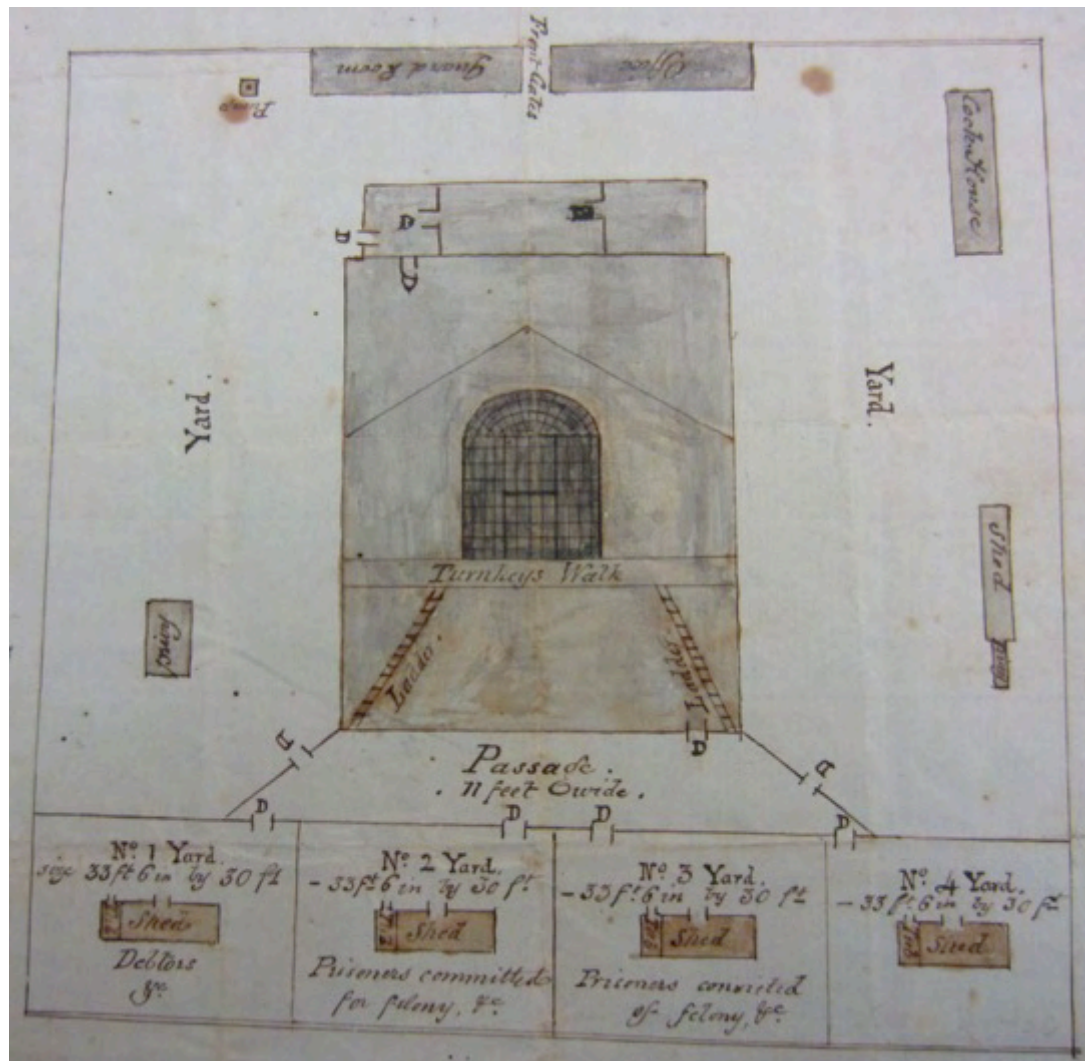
Sketch plan of proposed division and layout, 1852.
